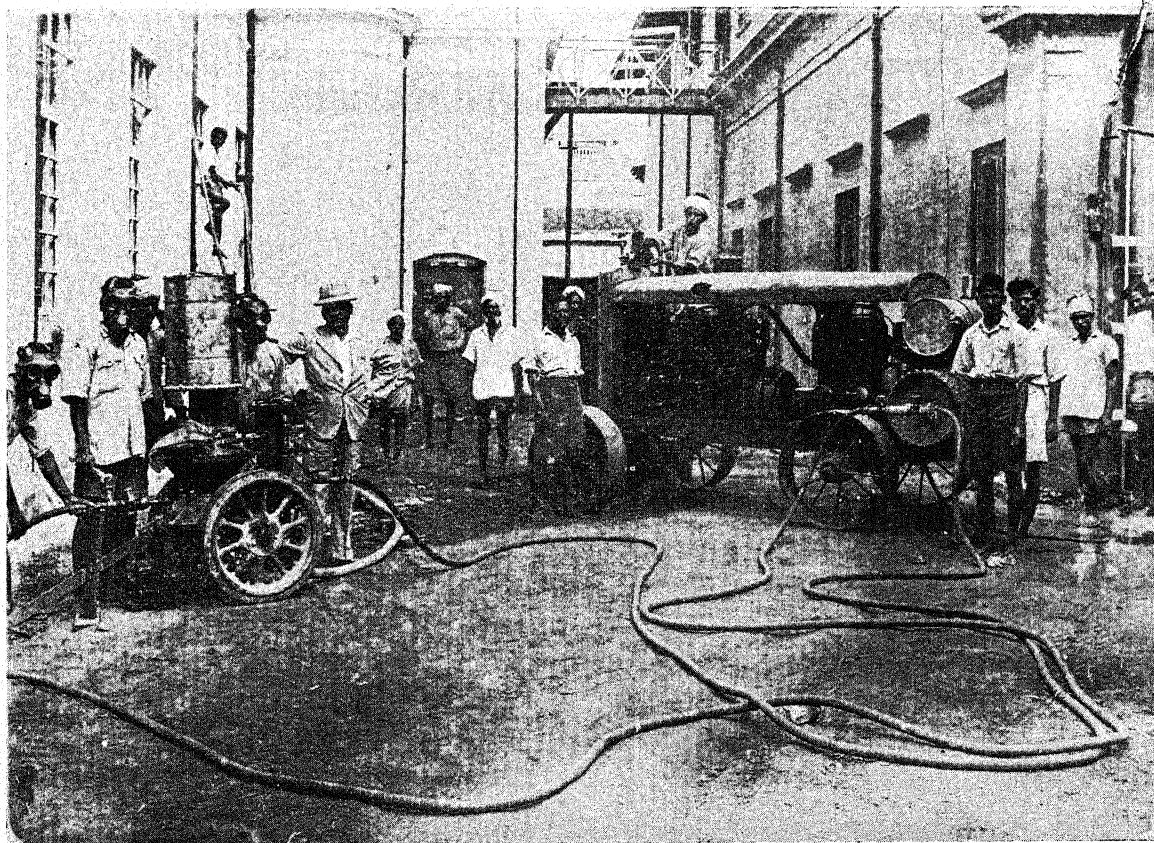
A. Gunniting machine. B. Compressed air machine.
